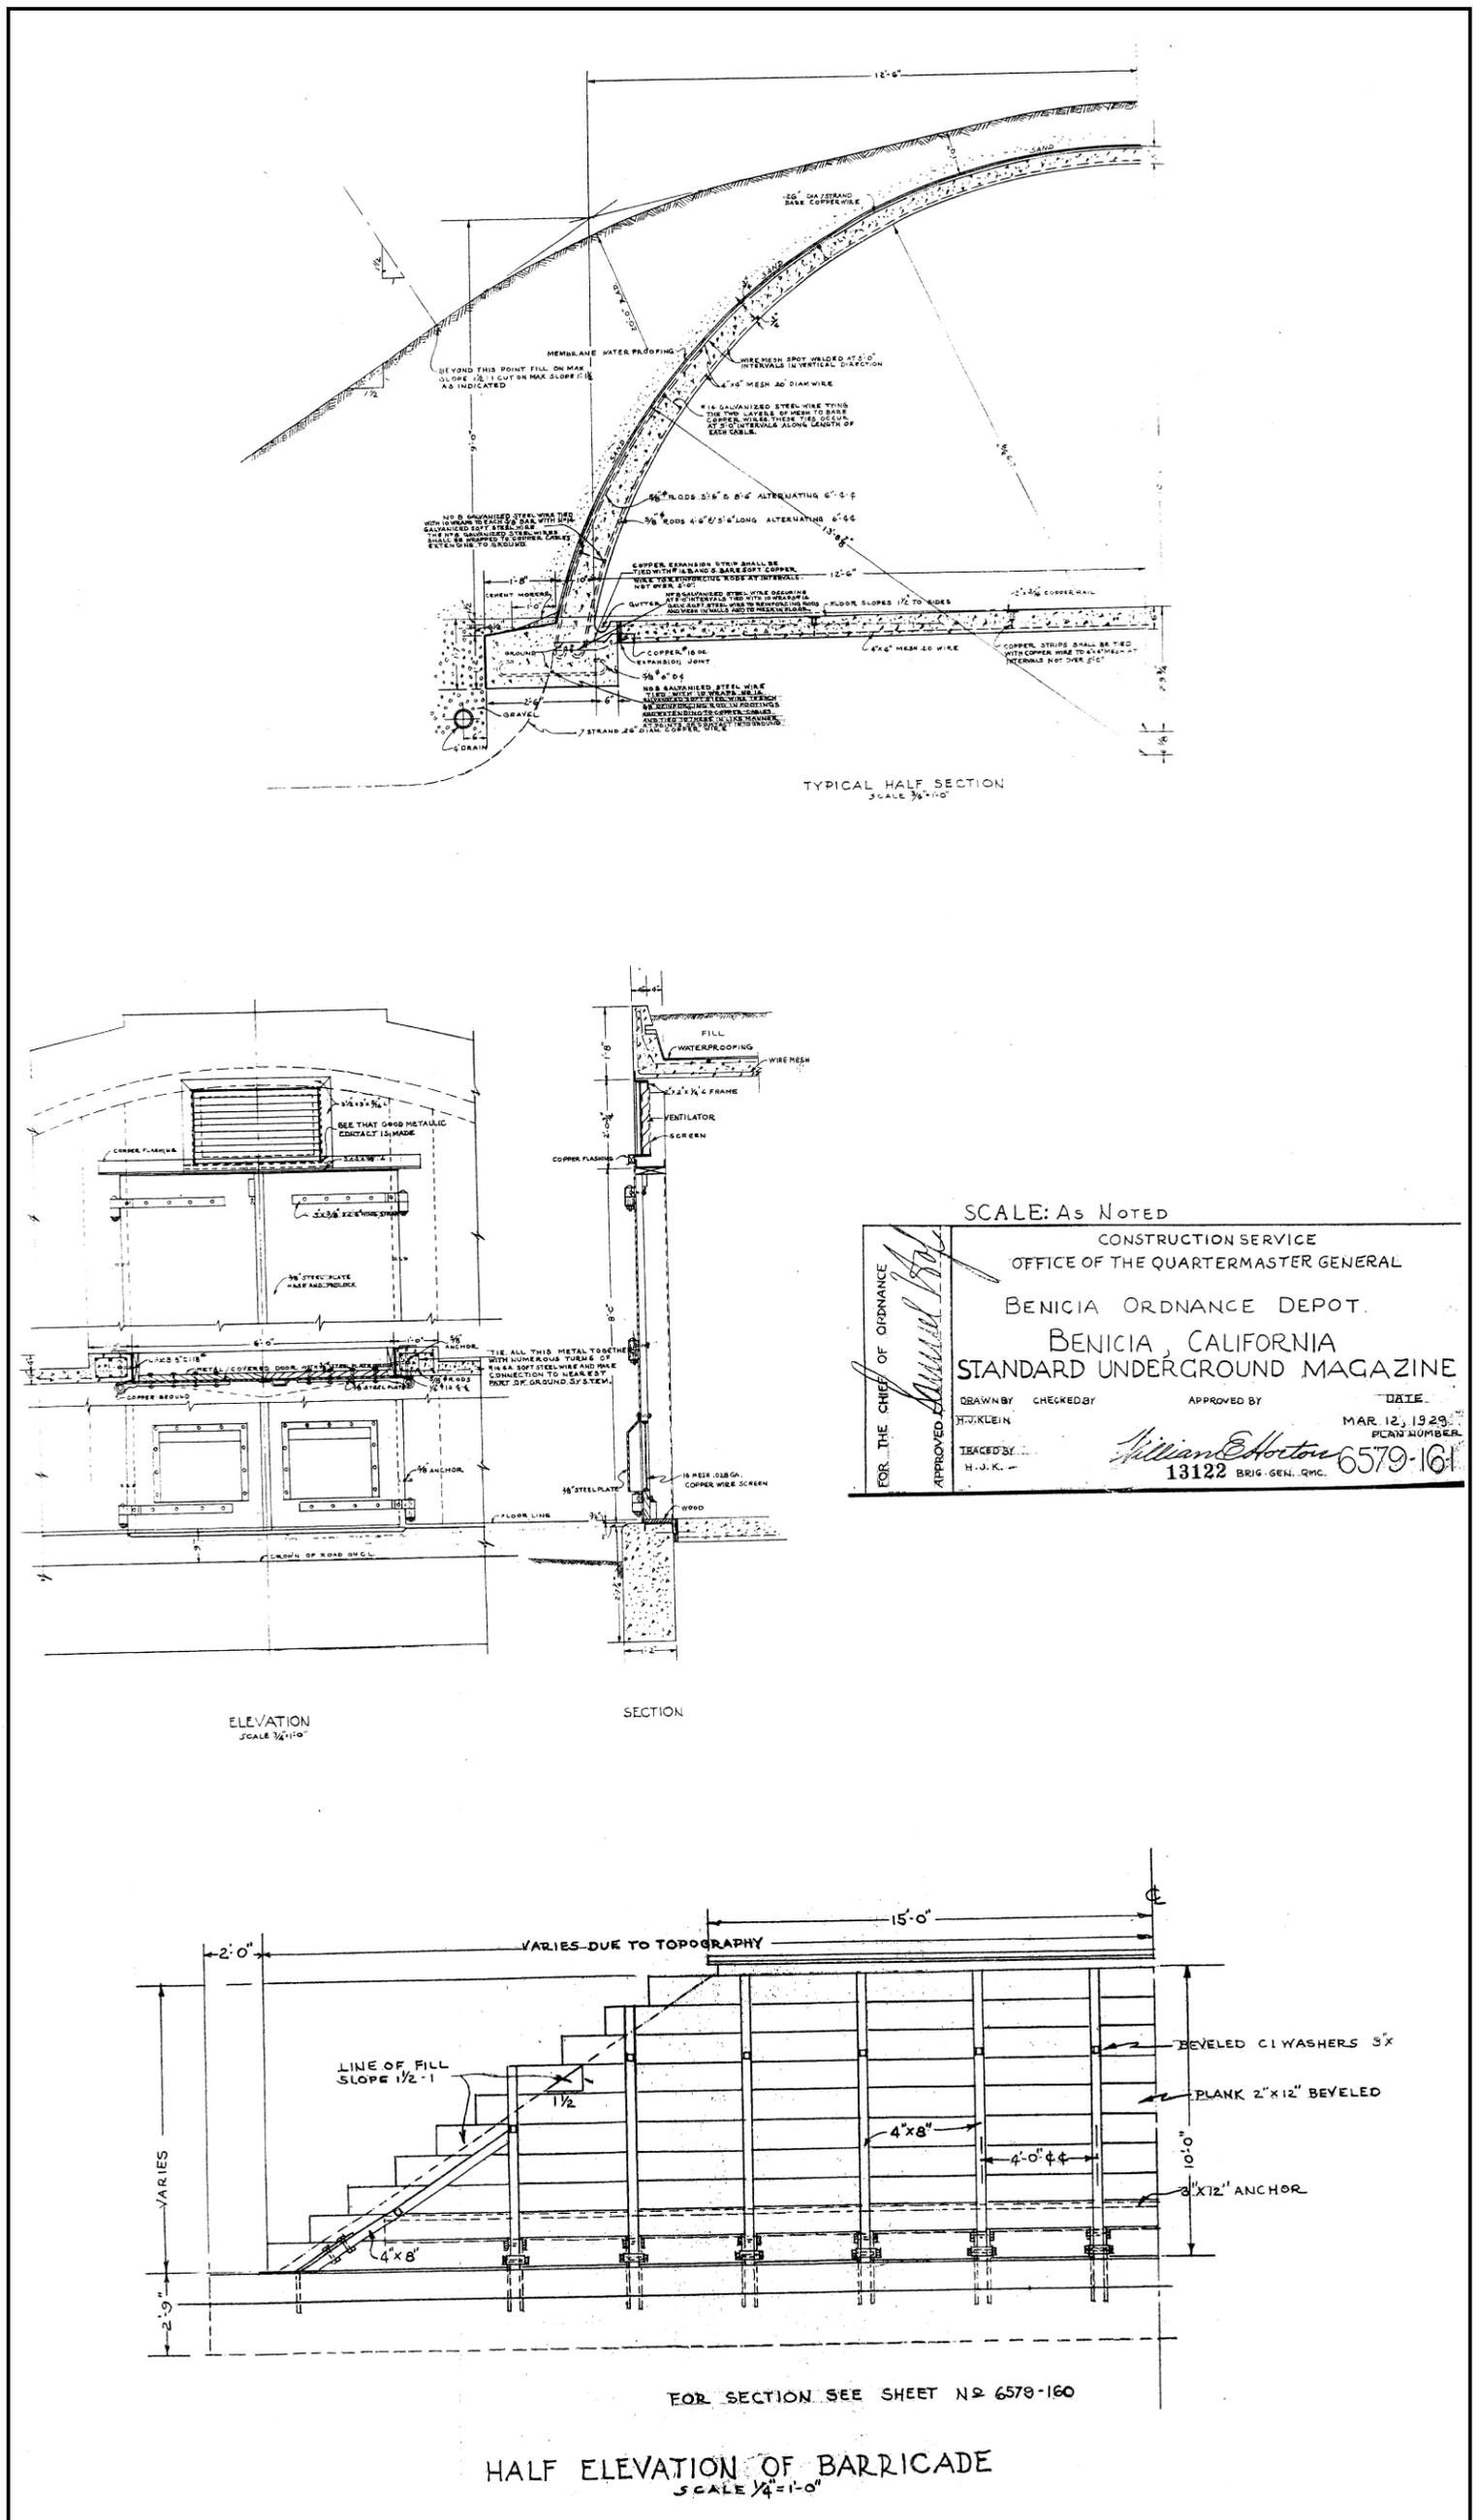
Plans for standard underground magazine constructed at Benicia Ordnance Depot.
